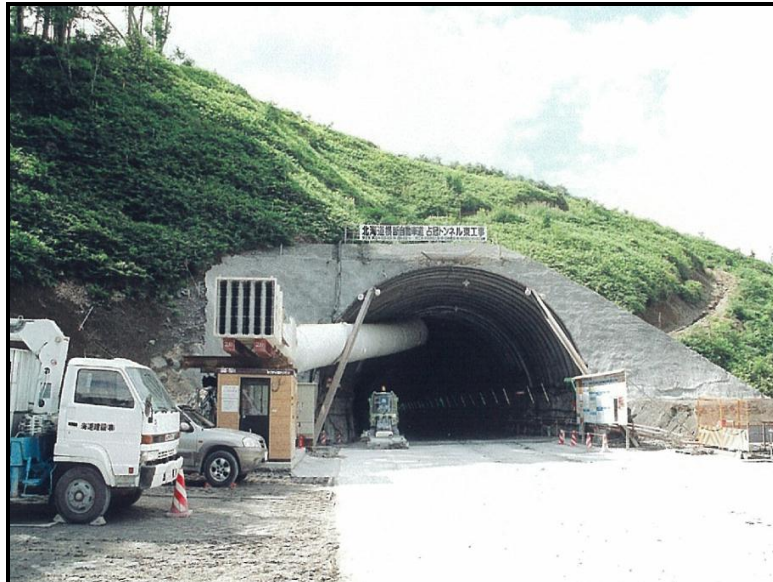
Tunnel entrance under construction (Source: JICA Study Team, July 2014)
